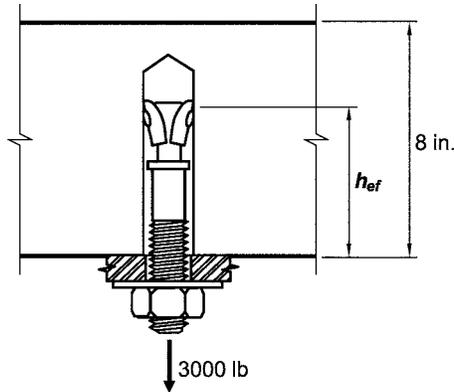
Example 3: Single post-installed anchor in tension away from edges.
